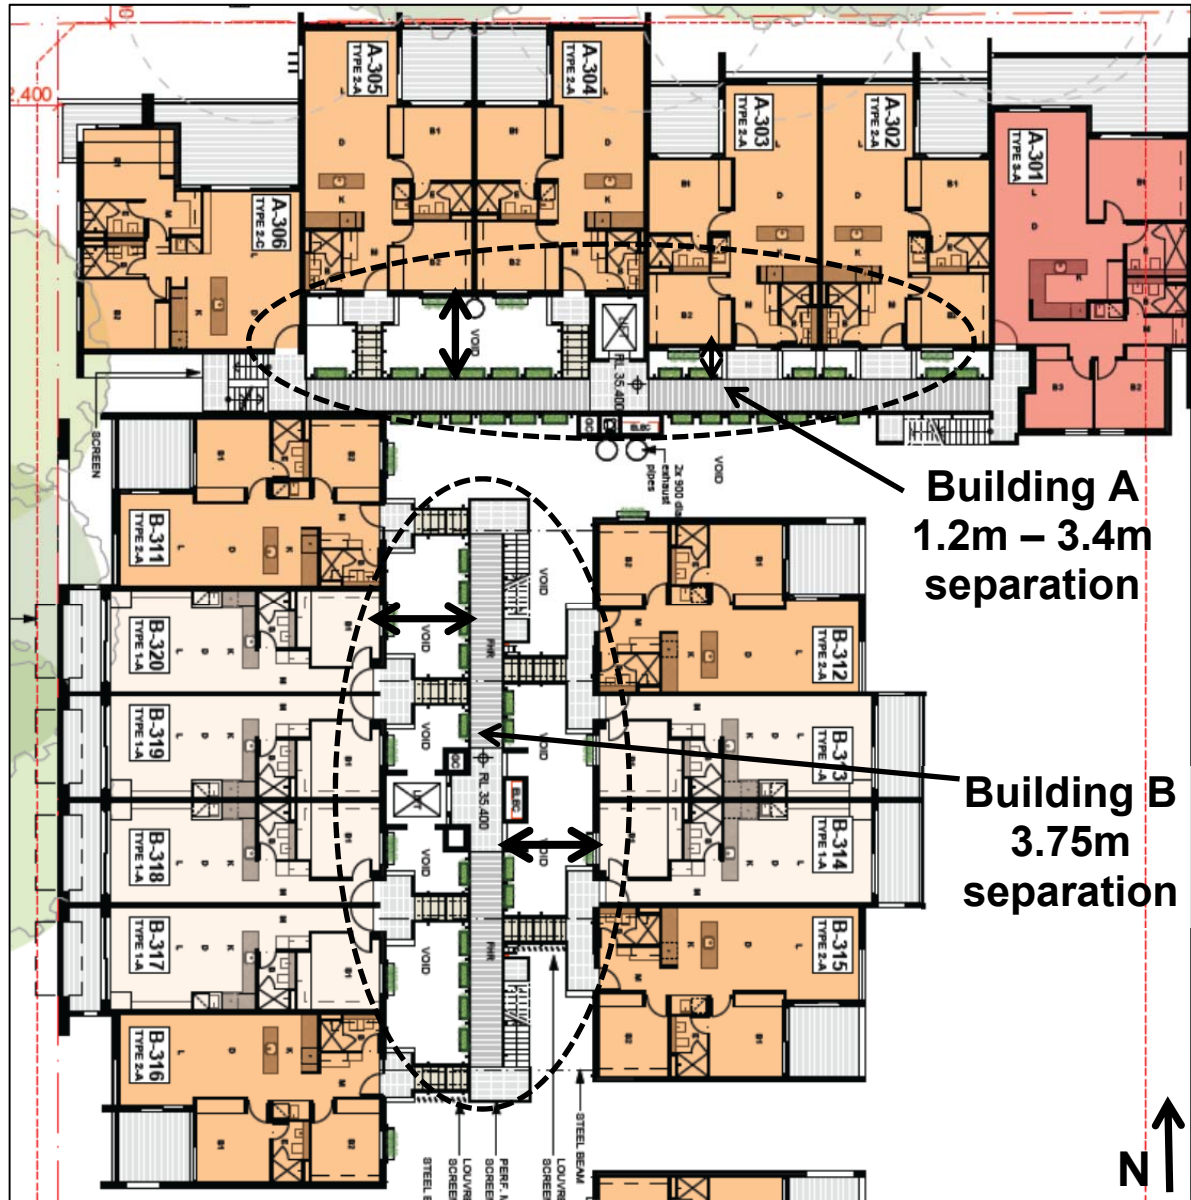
Separation distances between internal walkways to internally facing bedroom windows of apartments.
